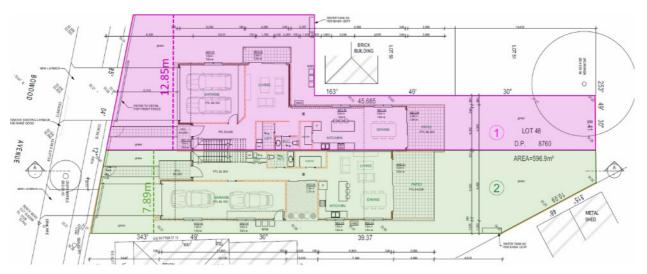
Extract of the floor plan, illustrating proposed Lot 1 in pink and proposed Lot 2 in green with associated building line widths, 12.85m and 7.89m, respectively.
